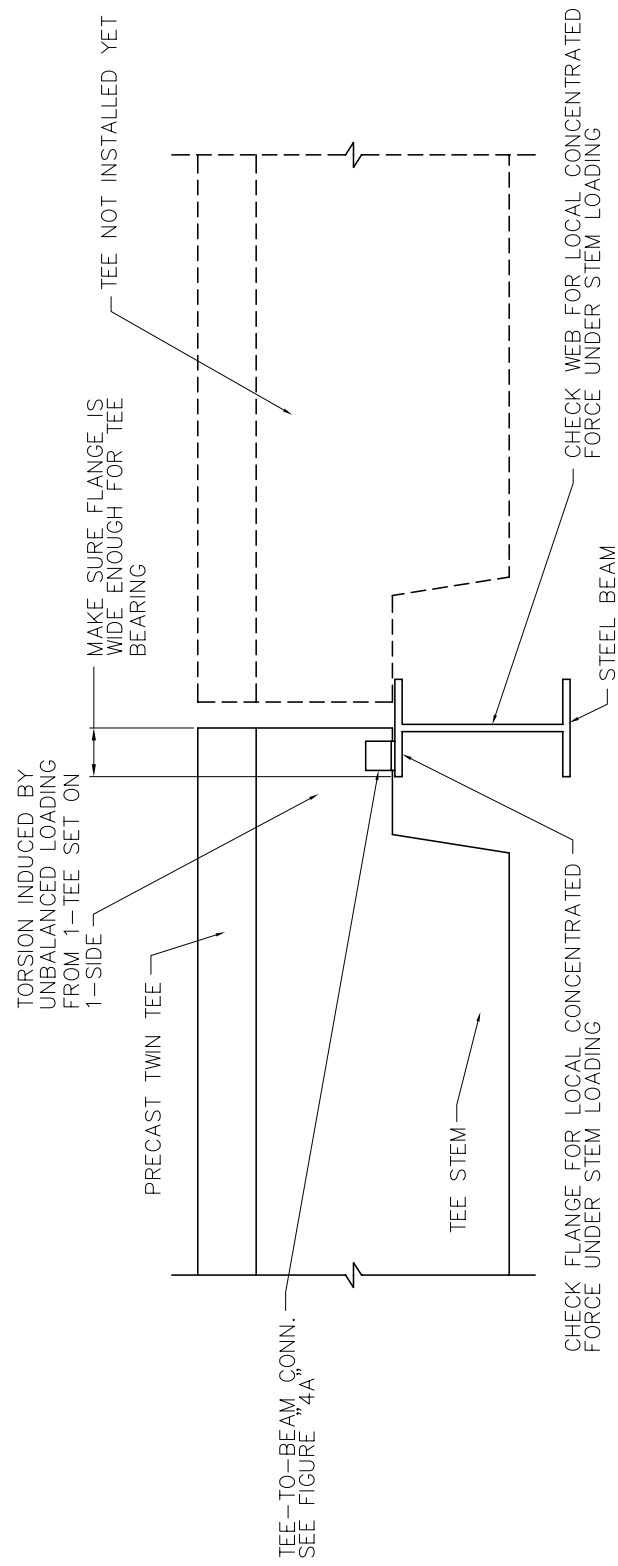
Typical Double Tee on Beam Cross-Section
